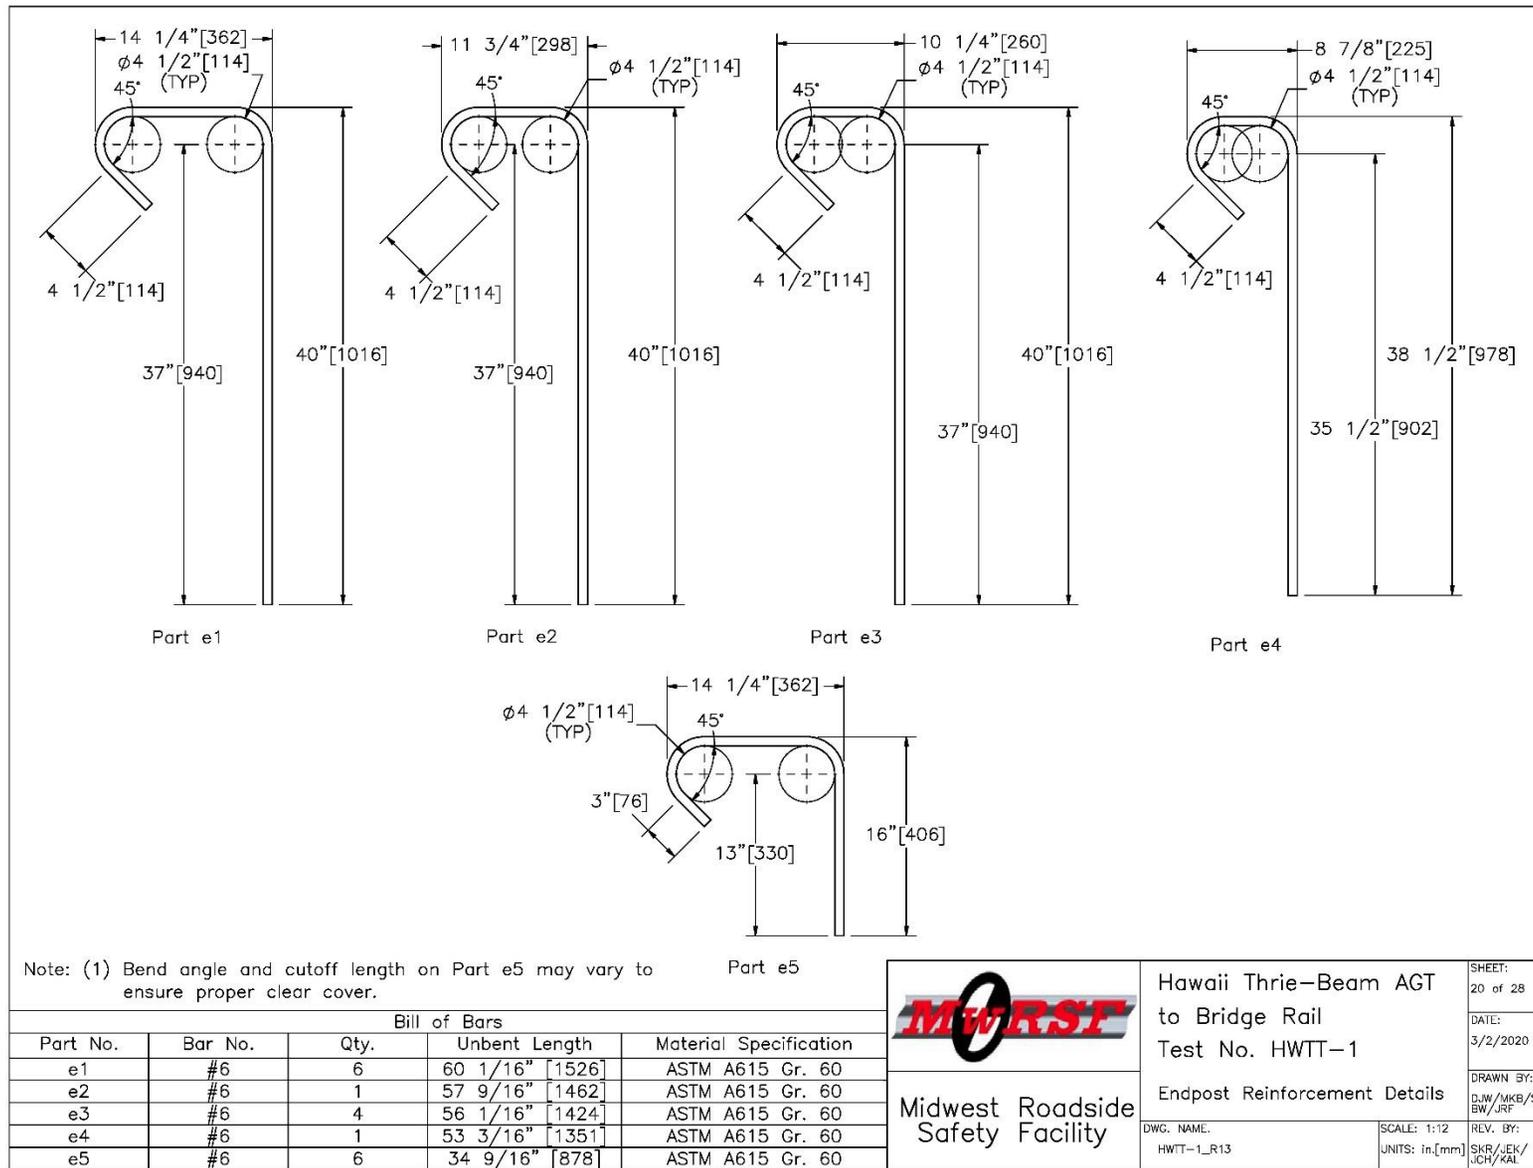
End Post Reinforcement Details, Test Nos. HWTT-1 and HWTT-2
